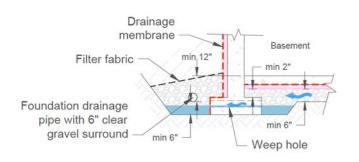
Typical best practice detail for a foundation drainage system. Photo 3: Perimeter drainage on building with gravel bedding.
